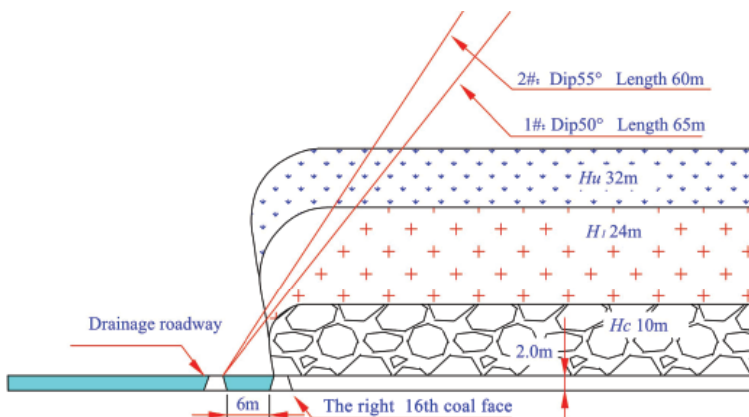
Cross-sectional view of boreholes layout in the right 16-th coal face
